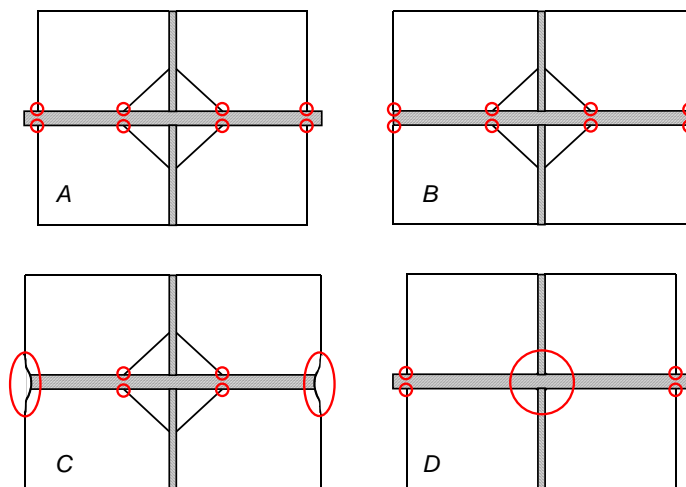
Steel Girder and Stiffener Detail Under Flexural Loading
